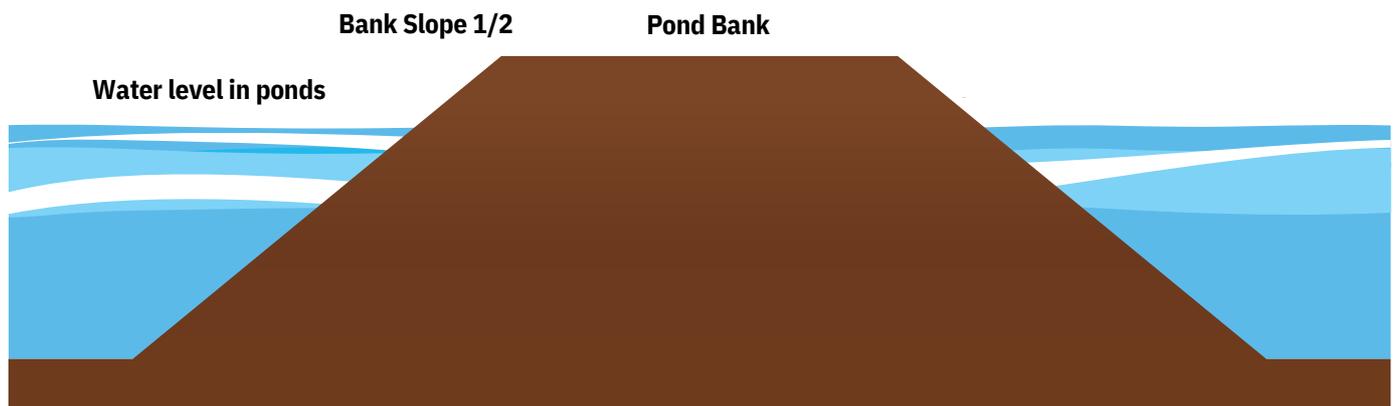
Cross section in pond bank separating two fish ponds. (Note the bank slope, water level in ponds and bank height.)
